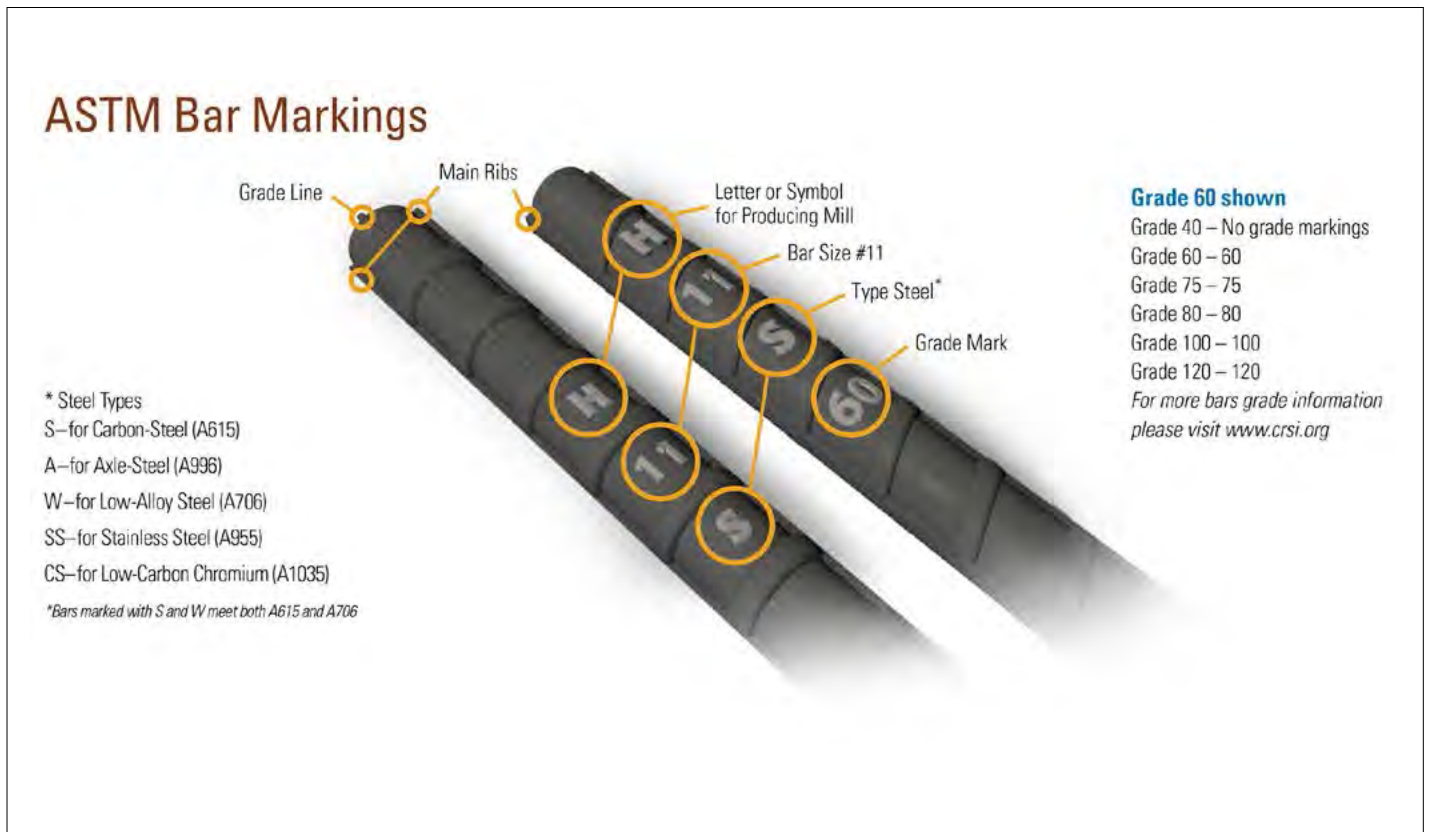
Example of the ASTM marking requirements for a #11, Grade 60 bar (from CRSI).
